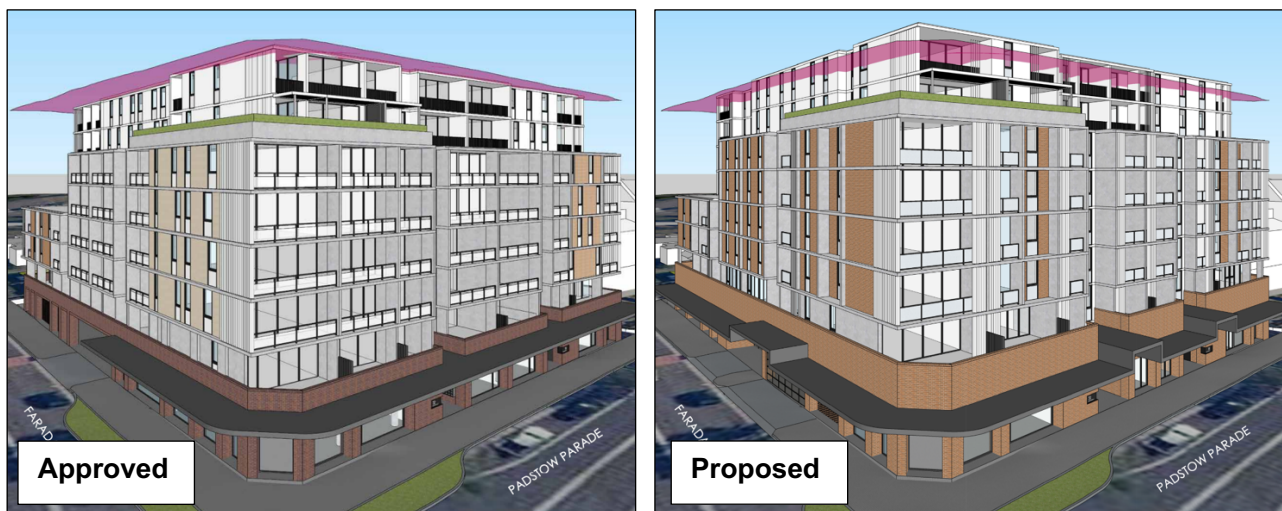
Perspective images of approved and proposed modified development with 26m building height plane
